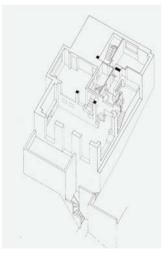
Axonometric view showing main rooms and reinforced concrete columns (shaded black) Adolf Loos: Müller House, Prague (CZ), 1930
